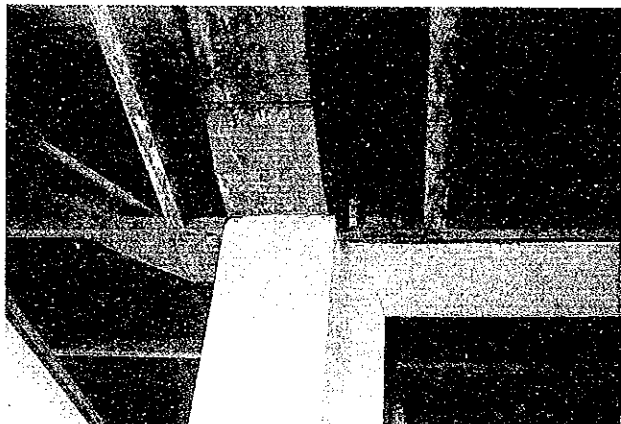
Same Building; Close Up of Beam-Column Joint at Top Floor
